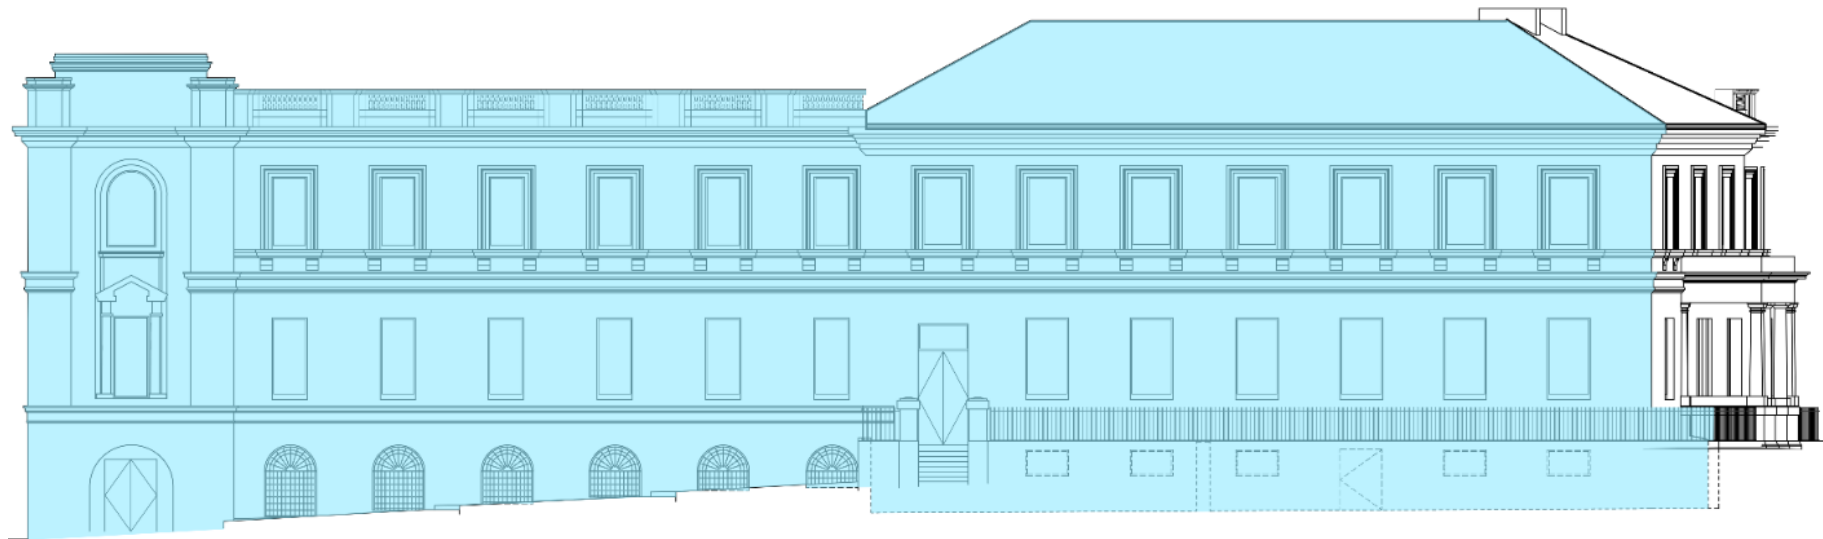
Grading Diagrams – Grading of Building Form and Spaces (Bridge Street Façade)
